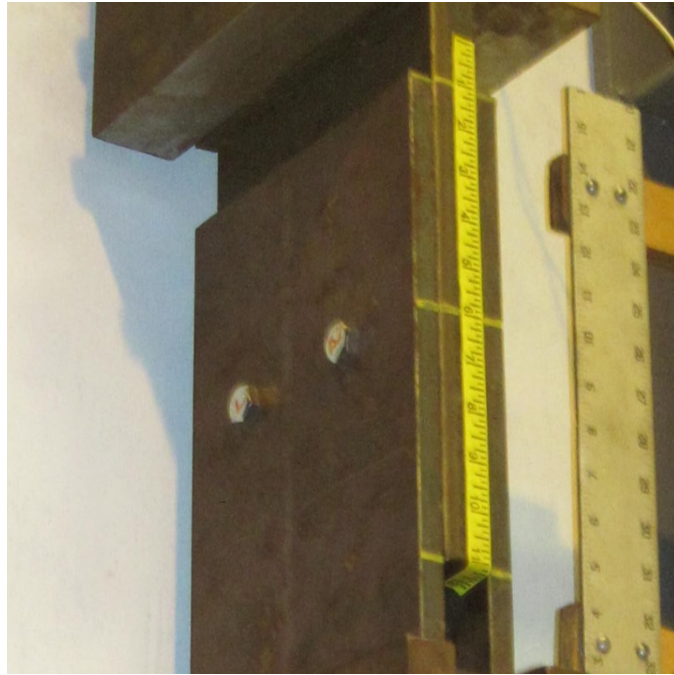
Typical Joint Configuration 2, Bolted, Double Shear Specimen.
